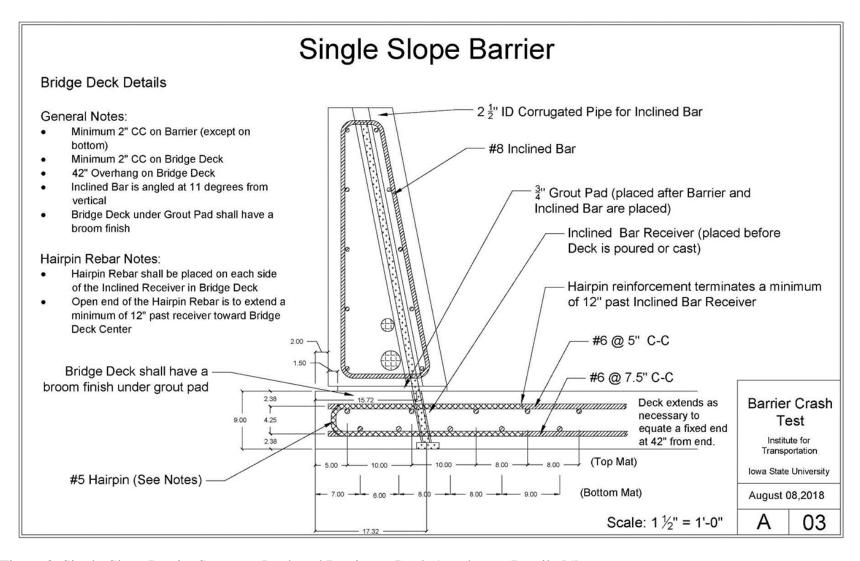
Single-Slope Barrier Segment, Deck and Barrier-to-Deck Attachment Details [5]
